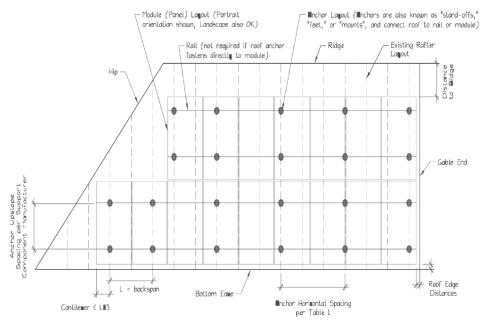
Sample Solar Panel Array and Anchor Layout Diagram (Roof Plan).
